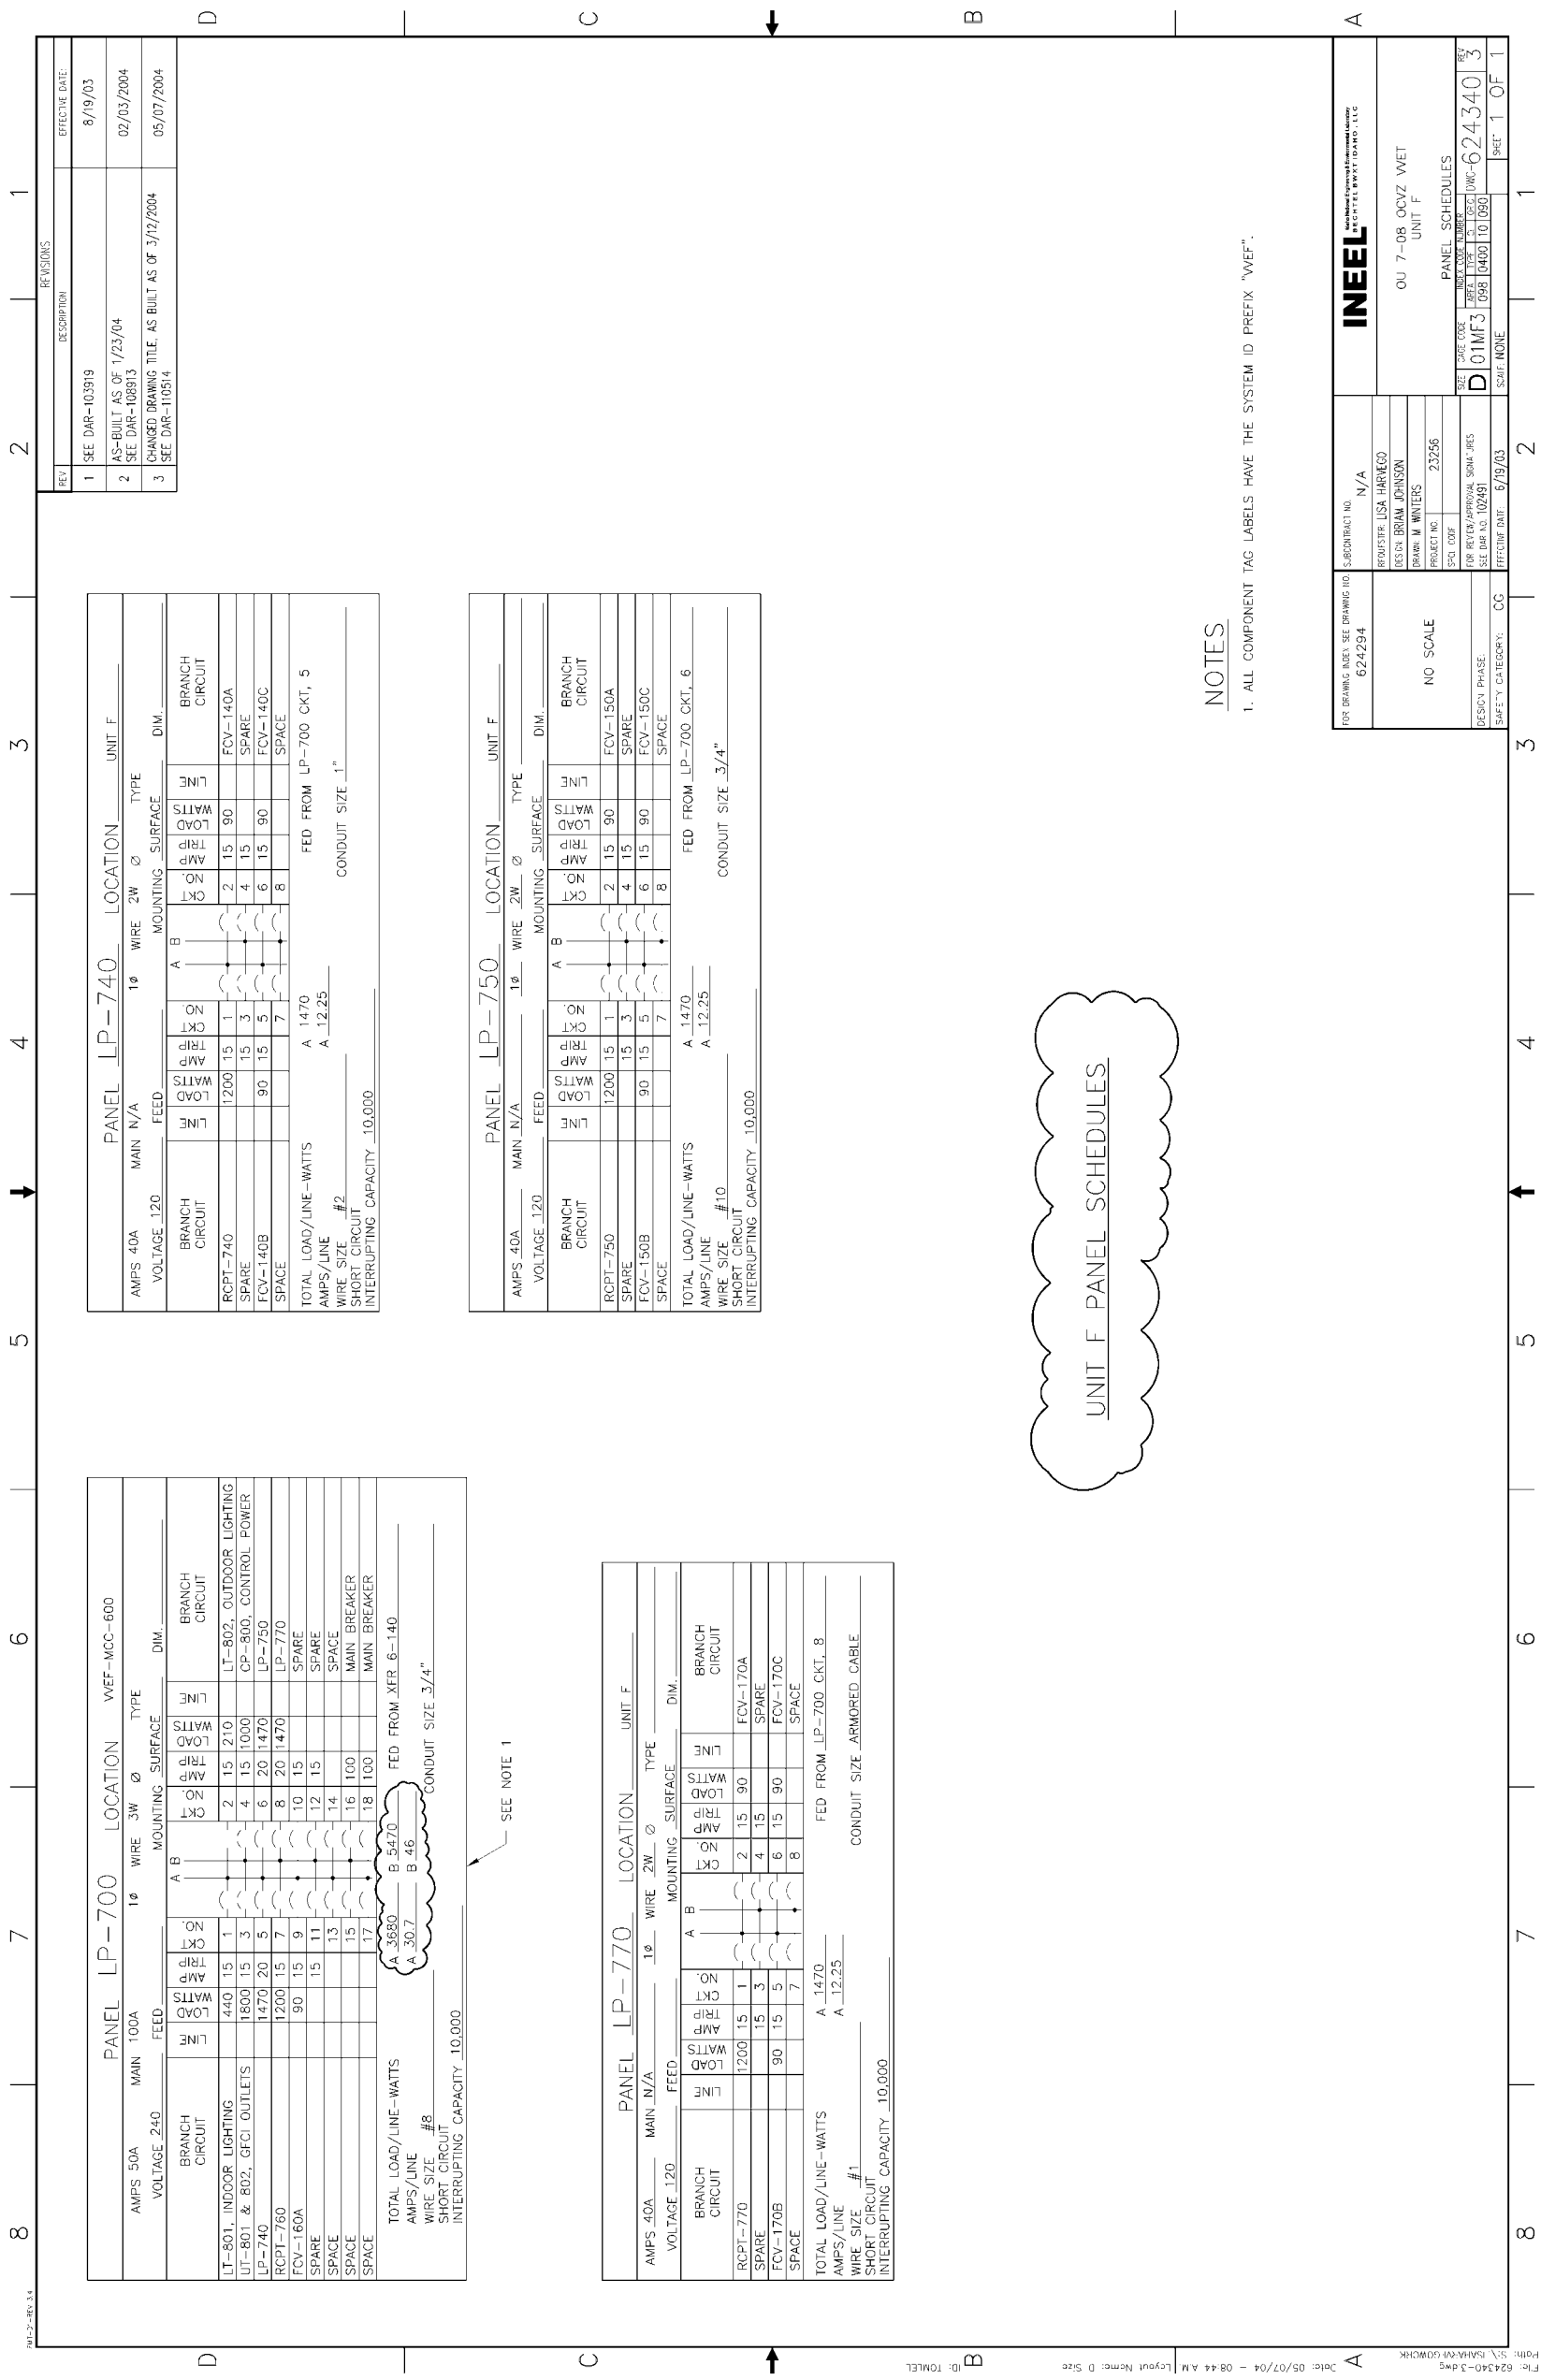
OU 7-08 OCVZ VVET Unit F Panel Schedules, Drawing No. 624340, Rev. 3.
